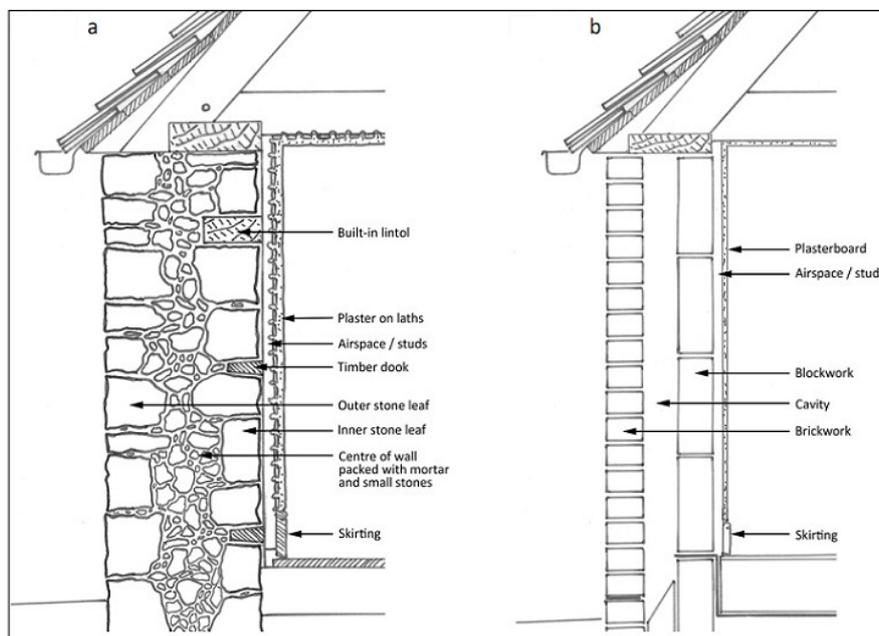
Comparison of (a) traditional solid masonry wall construction and (b) non-traditional cavity wall construction [10].
